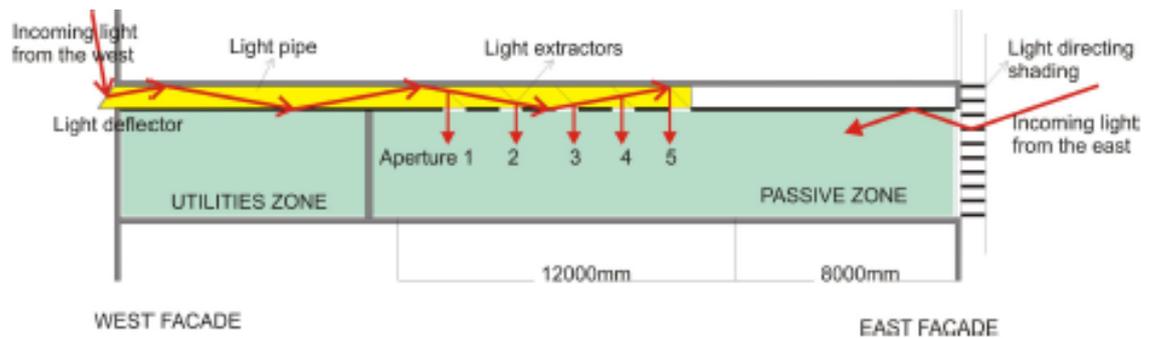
Section of the RSSL in Waterfront House (Yeang, 2003)
